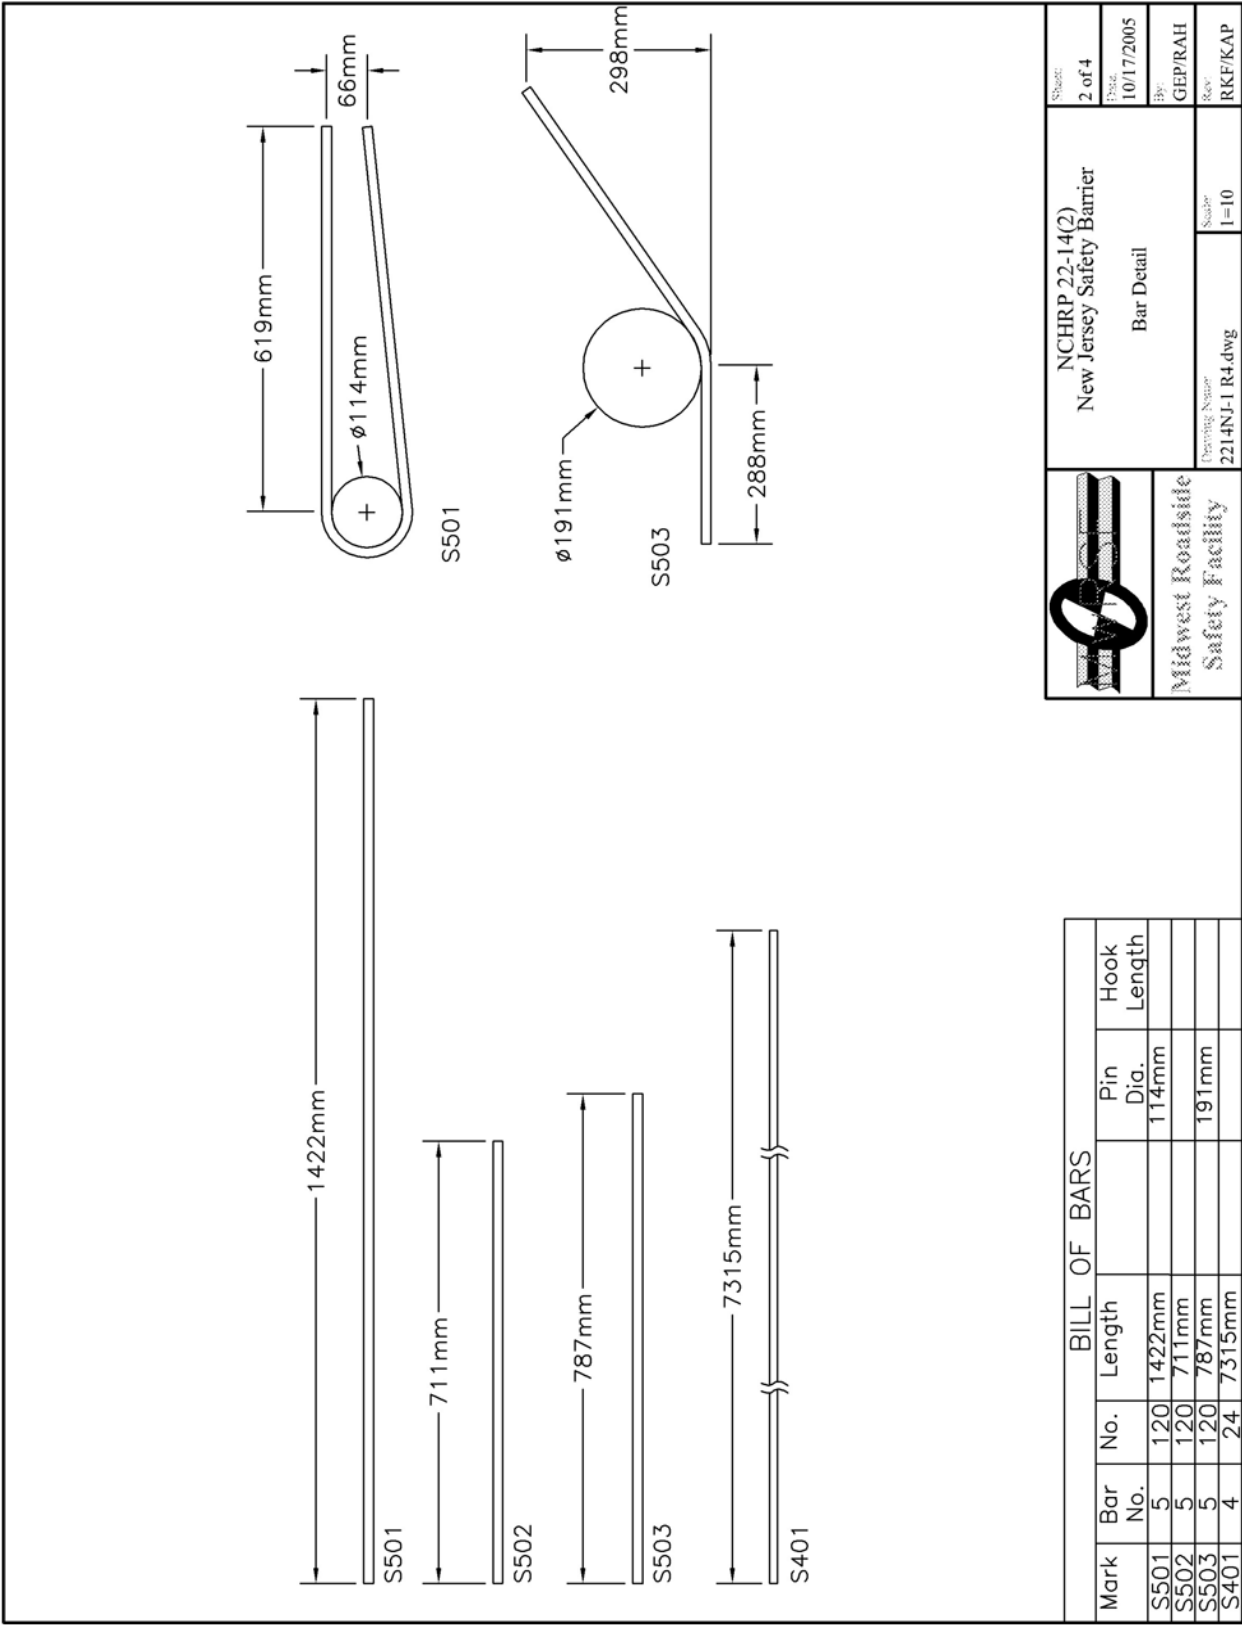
Permanent New Jersey Safety Shape Reinforcement Details
